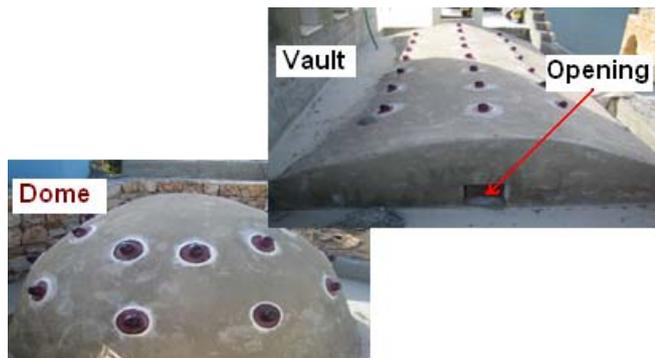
Dome and vaulted roof in Sakhnin green building
